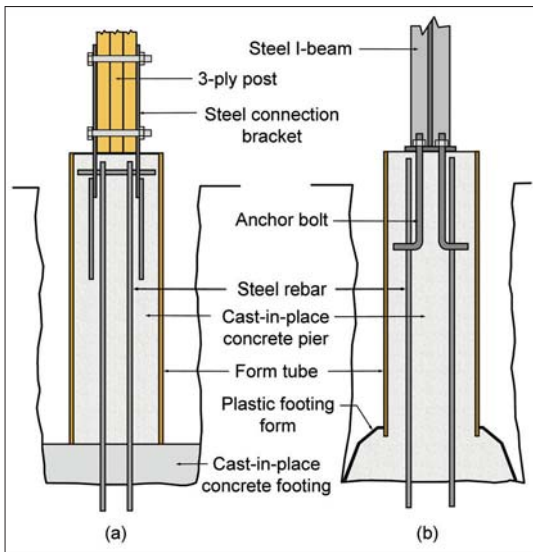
Front cross-sectional views of cast-in-place reinforced concrete piers. (a) Footing cast separately from column, and (b) footing cast simultaneously with pier using plastic footing form. Piers are formed using concrete forming tubes.
